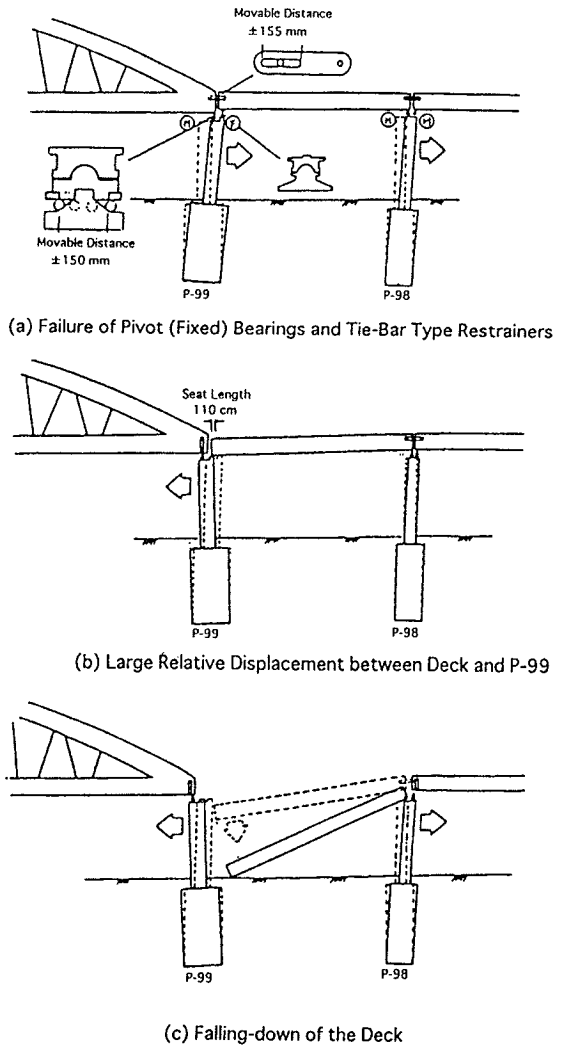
Failure Mechanism of an Approaching Bridge to Nishinomiya Bridge, Route 5, Bay Shore Line of Hanshin Expressway
